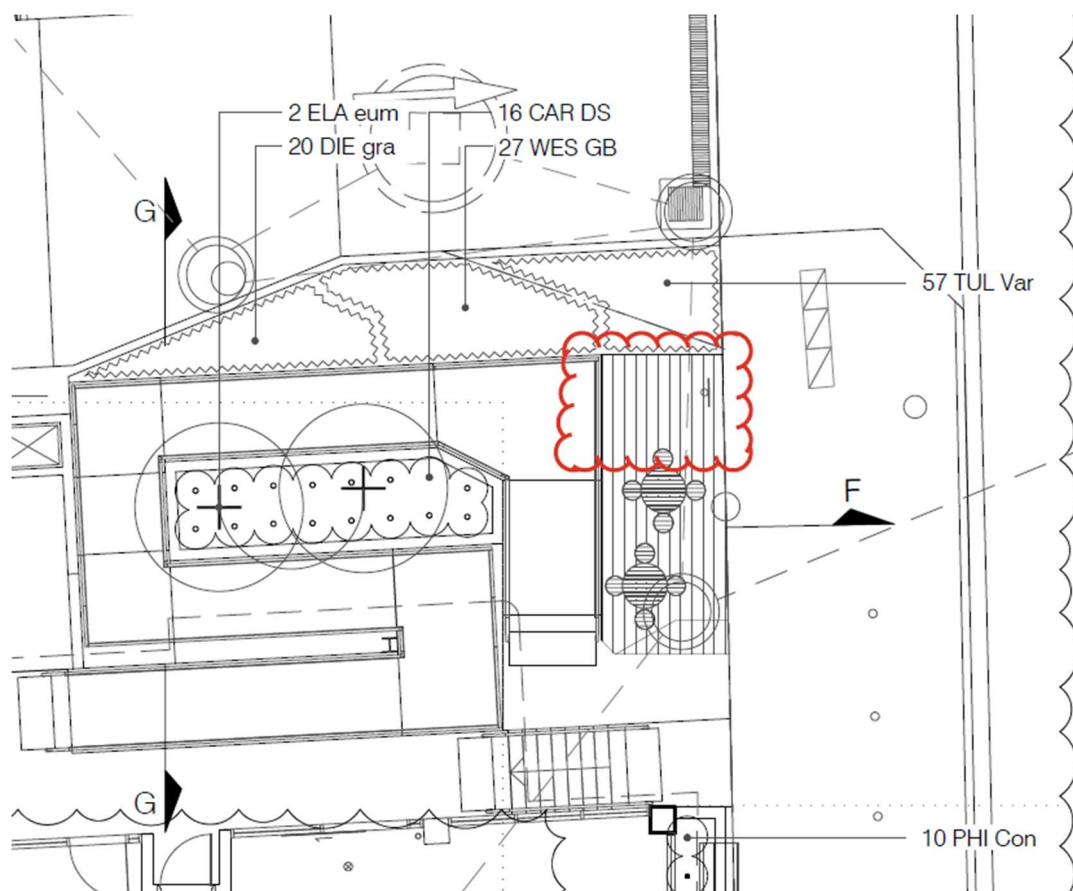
Minor Change Proposed Plan (Drawing No. LP.303 (Rev F))
